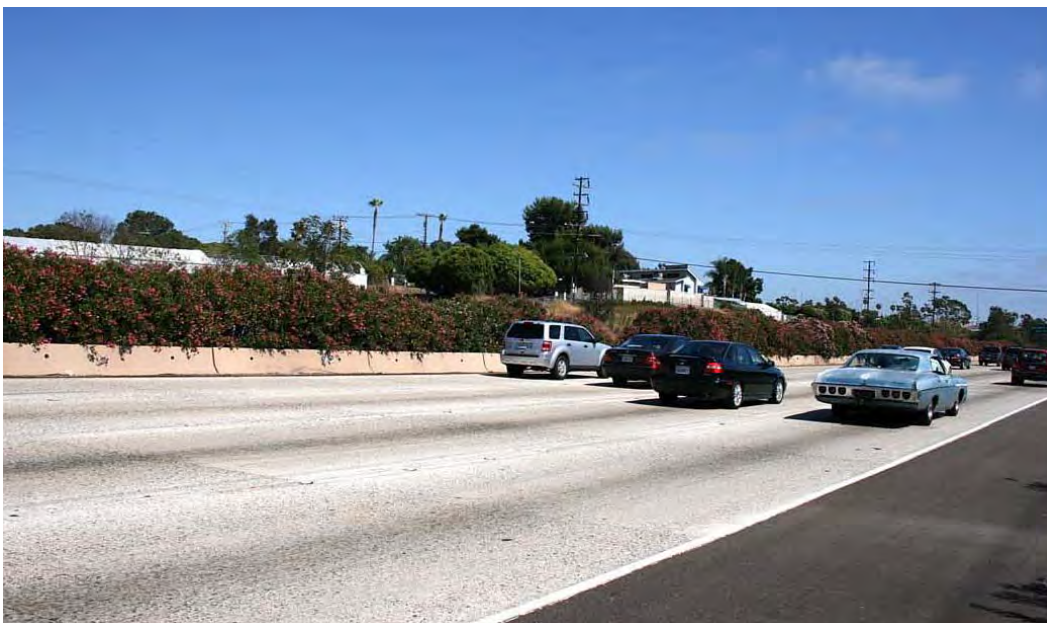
California Street overpass: Existing view looking northeast at I-5
